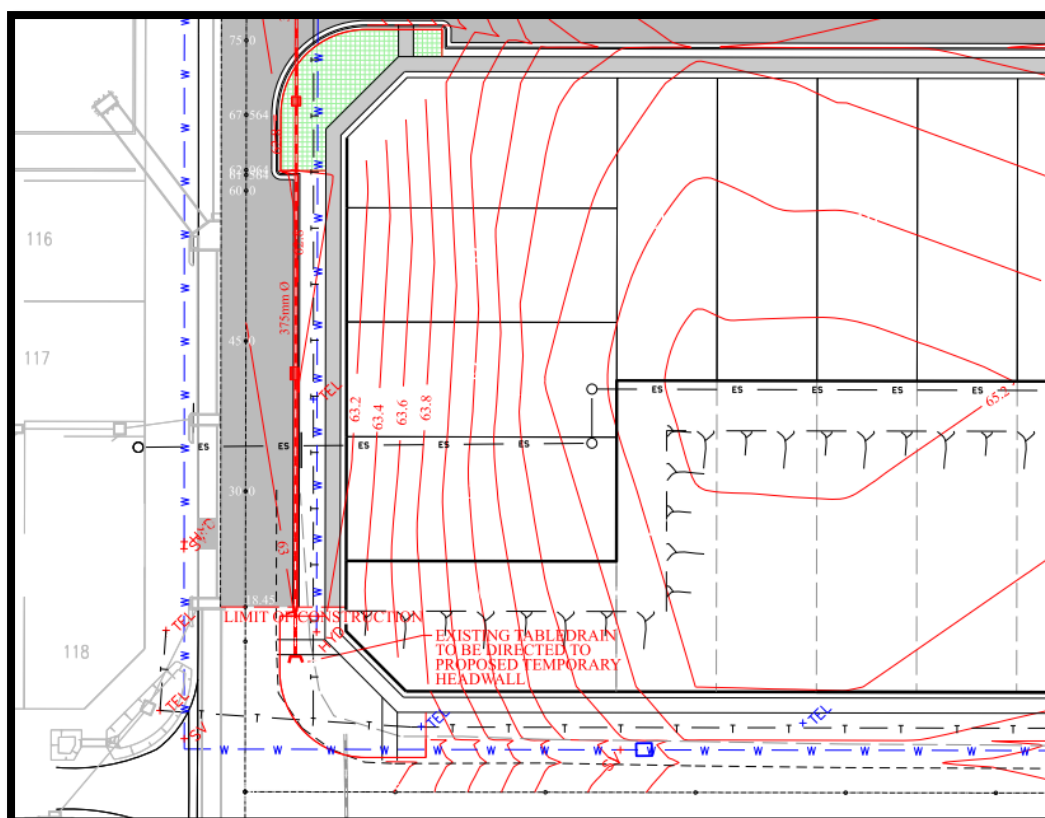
Extract of the Southwest Corner of Stage 1 Engineering Plans (Source: R. S. Canceri)
